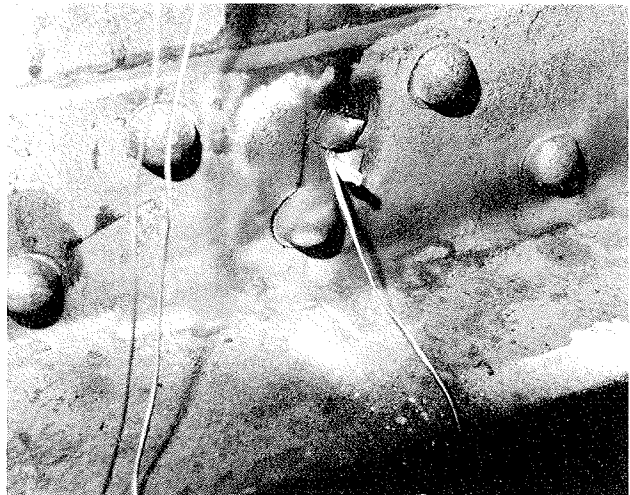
Fatigue cracked riveted section in test beam 3, after several reduced temperature tests.
